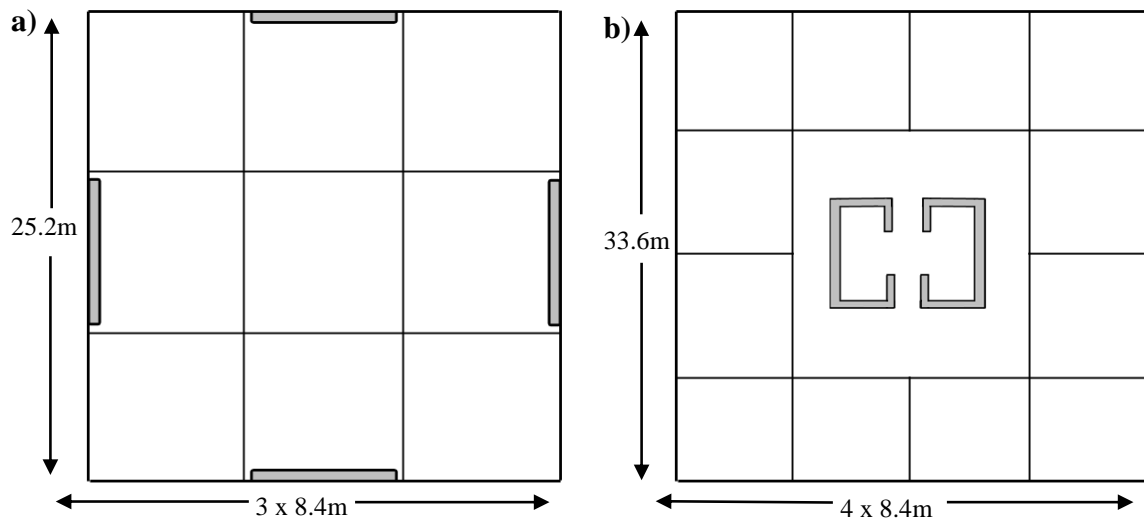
PLAN VIEW OF MID-RISE BUILDING WITH (A) PERIPHERAL WALLS AND (B) C-SHAPED CORES
